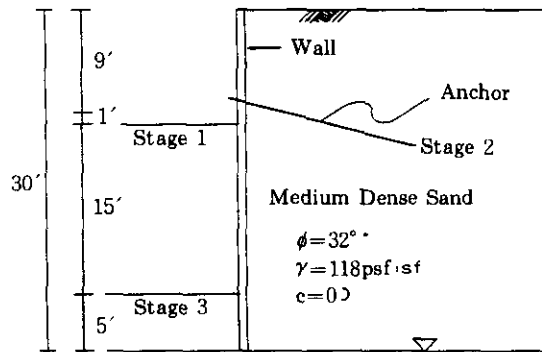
Construction Sequence of Anchored Wall Excavation (Texas Case)
